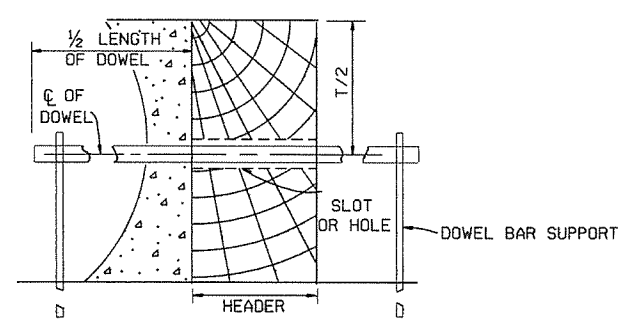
DETAIL OF JOINT SUPPORT FOR EXPANSION JOINTS
